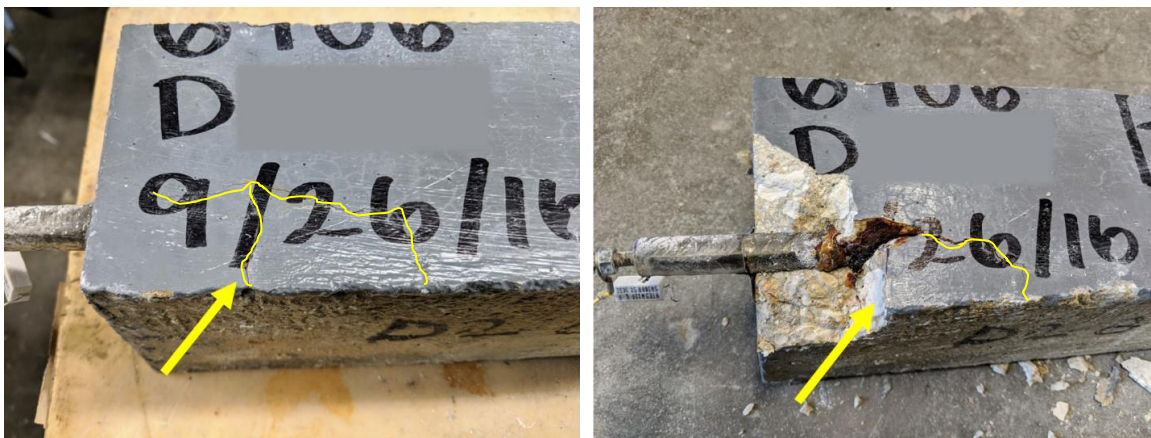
Evident cracking on side and bottom of beam specimen (left), and confirmation of unintended corrosion at bottom layer of rebar due to salt solution leaking (right)
